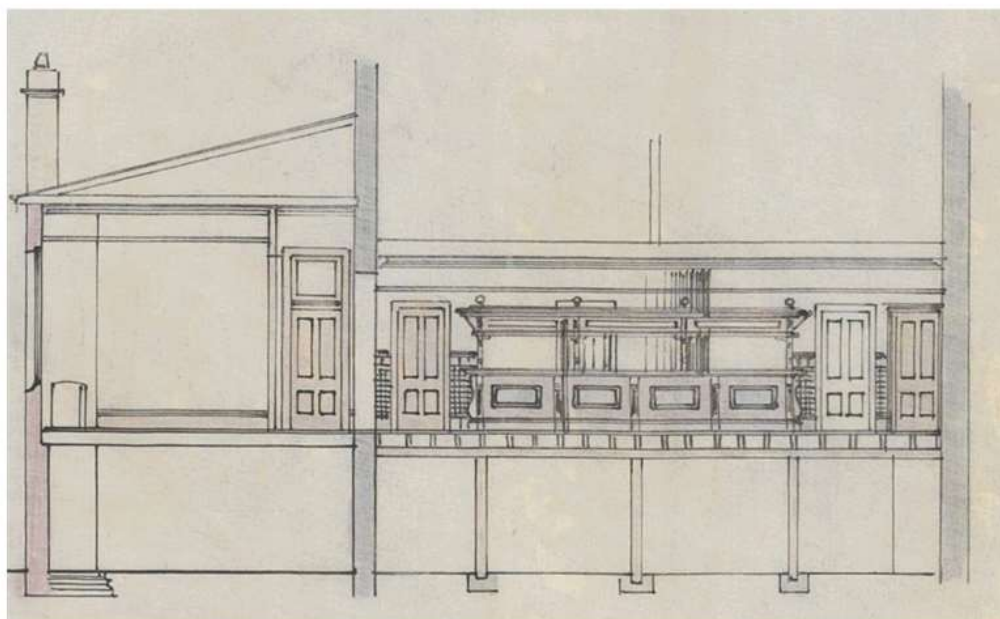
Detail of the 1911 plans showing the proposed new bar arrangements. The extant ground floor level ceiling reflects the corresponding bar arrangements in this space.
